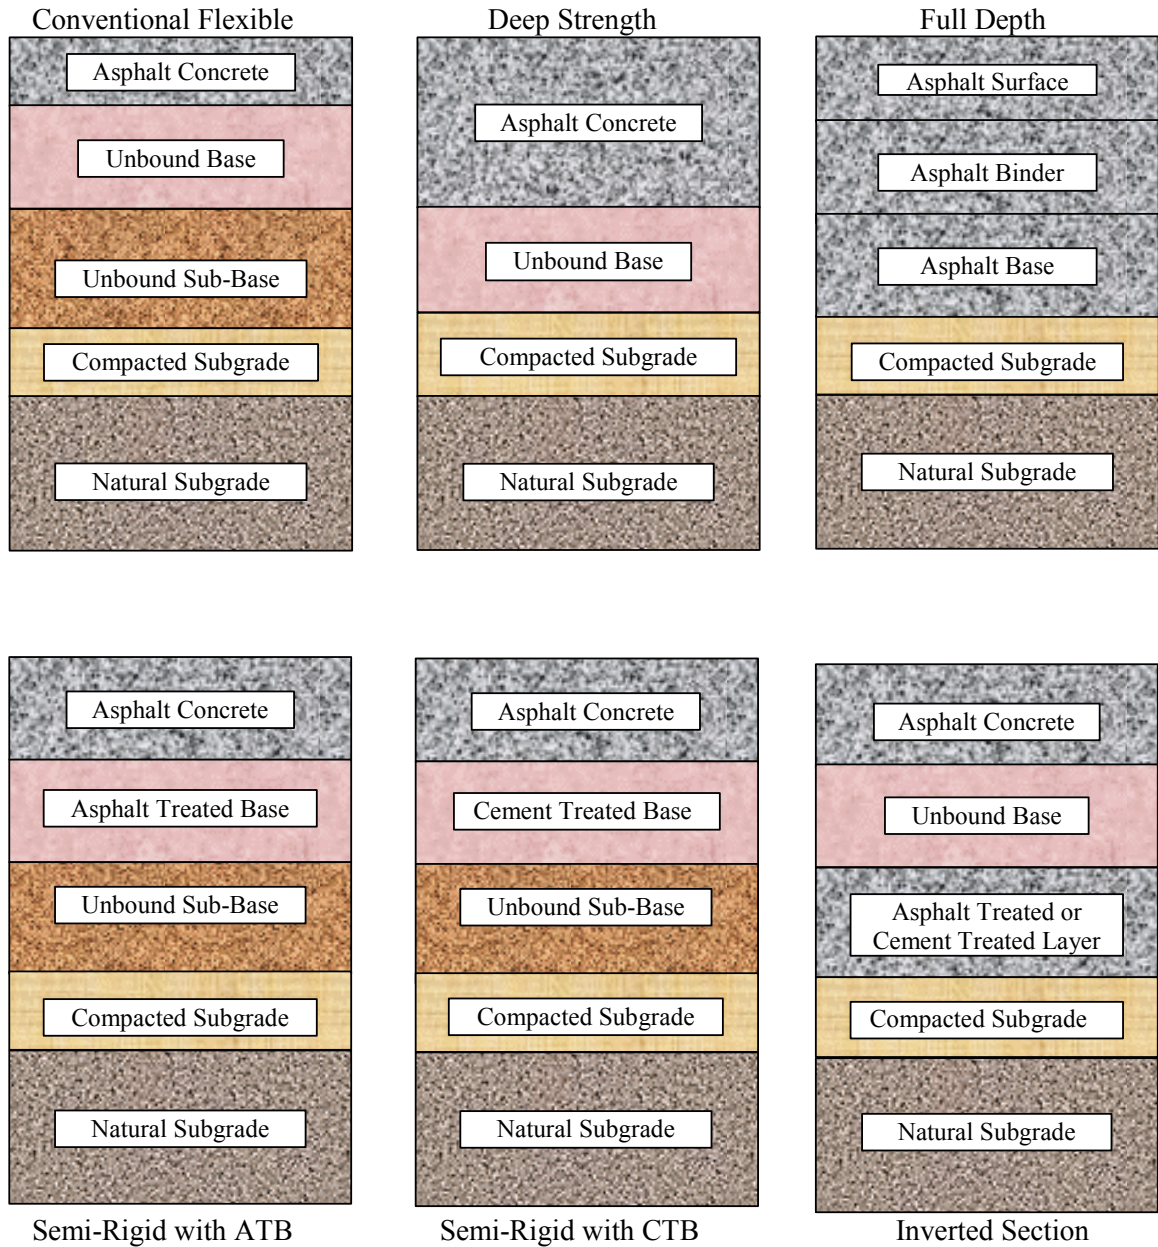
Some common variations of flexible pavement sections (NCHRP 1-37A, 2002).
